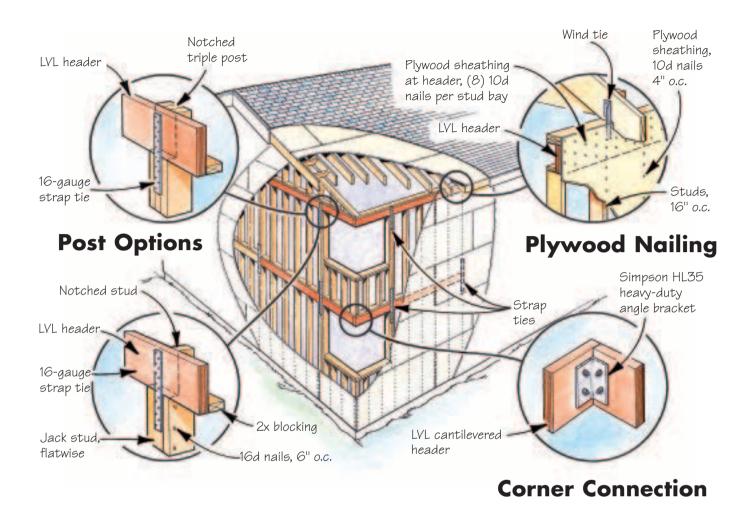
LVL headers, securely anchored to the wall framing by strap ties and thoroughly nailed sheathing, cantilever above the corner window opening. For a two-story structure, the lower header may be incorporated as the band joist.
